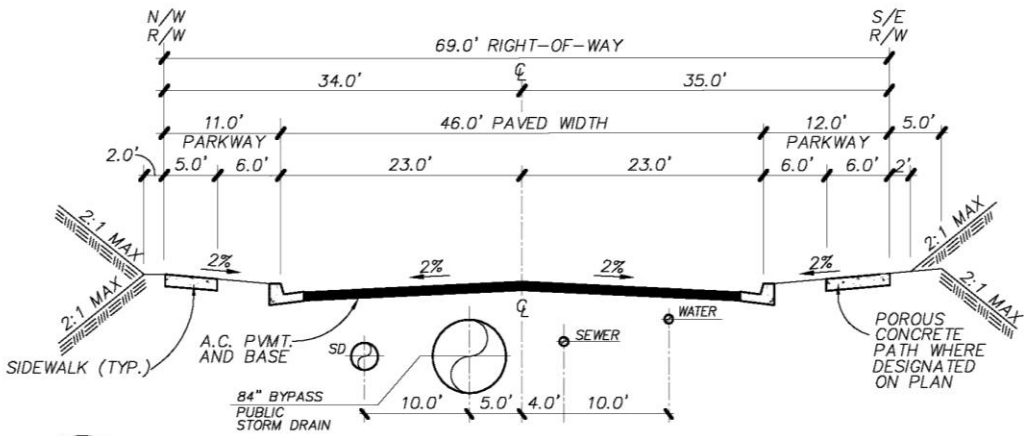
Street Section 9 -Private Modified Residential Street
